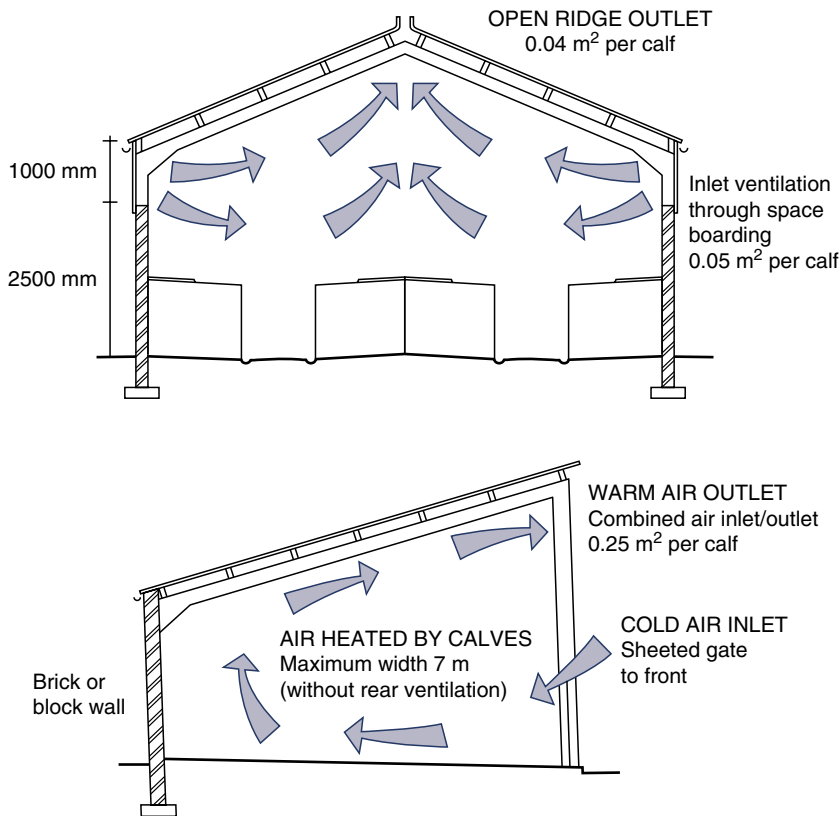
Airflow in monopitch and ridged-roof buildings.
